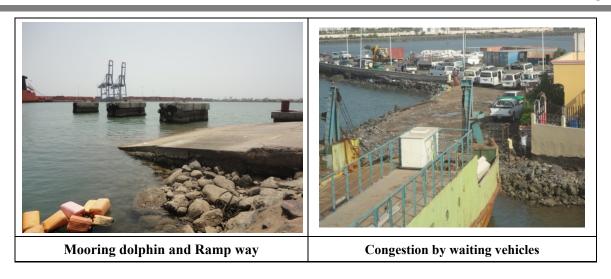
Existing Ferry Berthing Facility Layout at Djibouti Port
